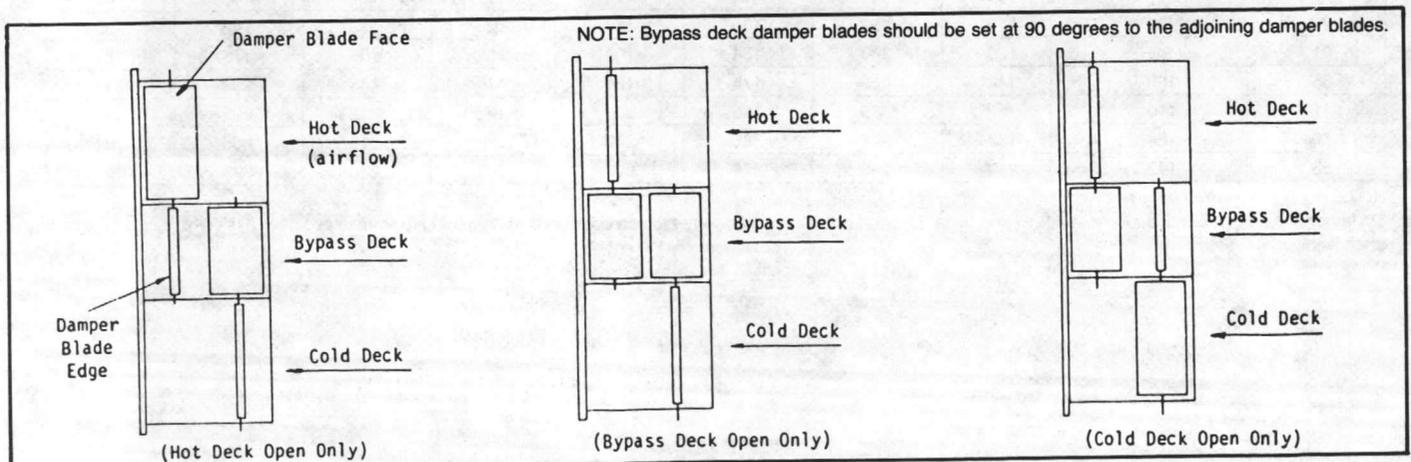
B - Proper Three-Deck Multizone Damper Blade Configuration
